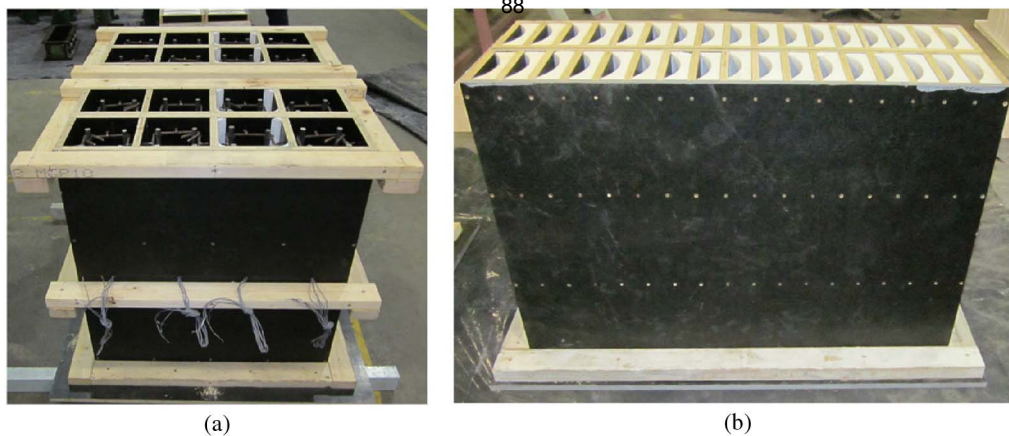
Formworks: (a) core columns and (b) concrete covers
